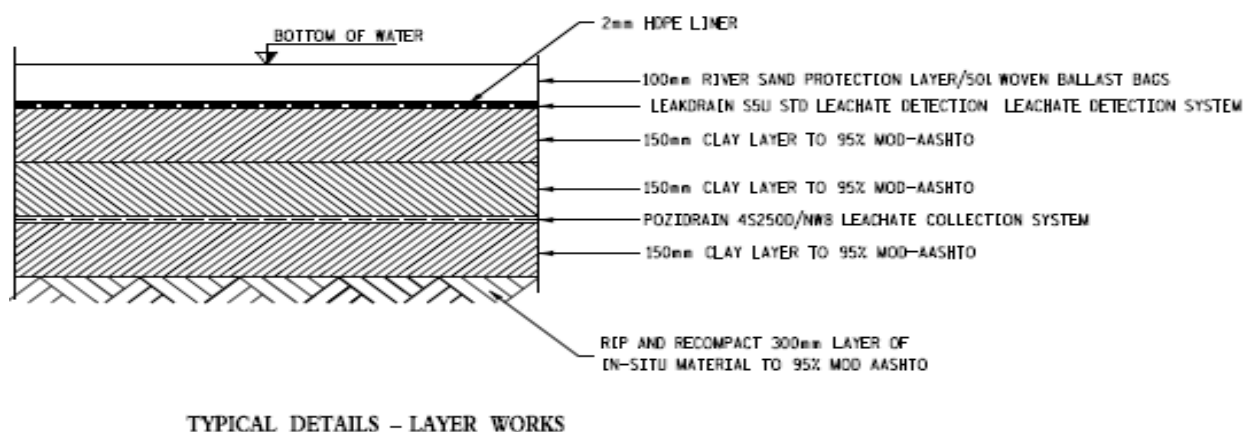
Section details of Earthworks for Maturation Pond & Seven Year Dam Lining, Detail Design (MSHAWENIØØ1)
